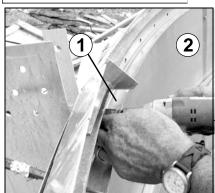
C-Channel on Attachment Flashing, Starter Ring
